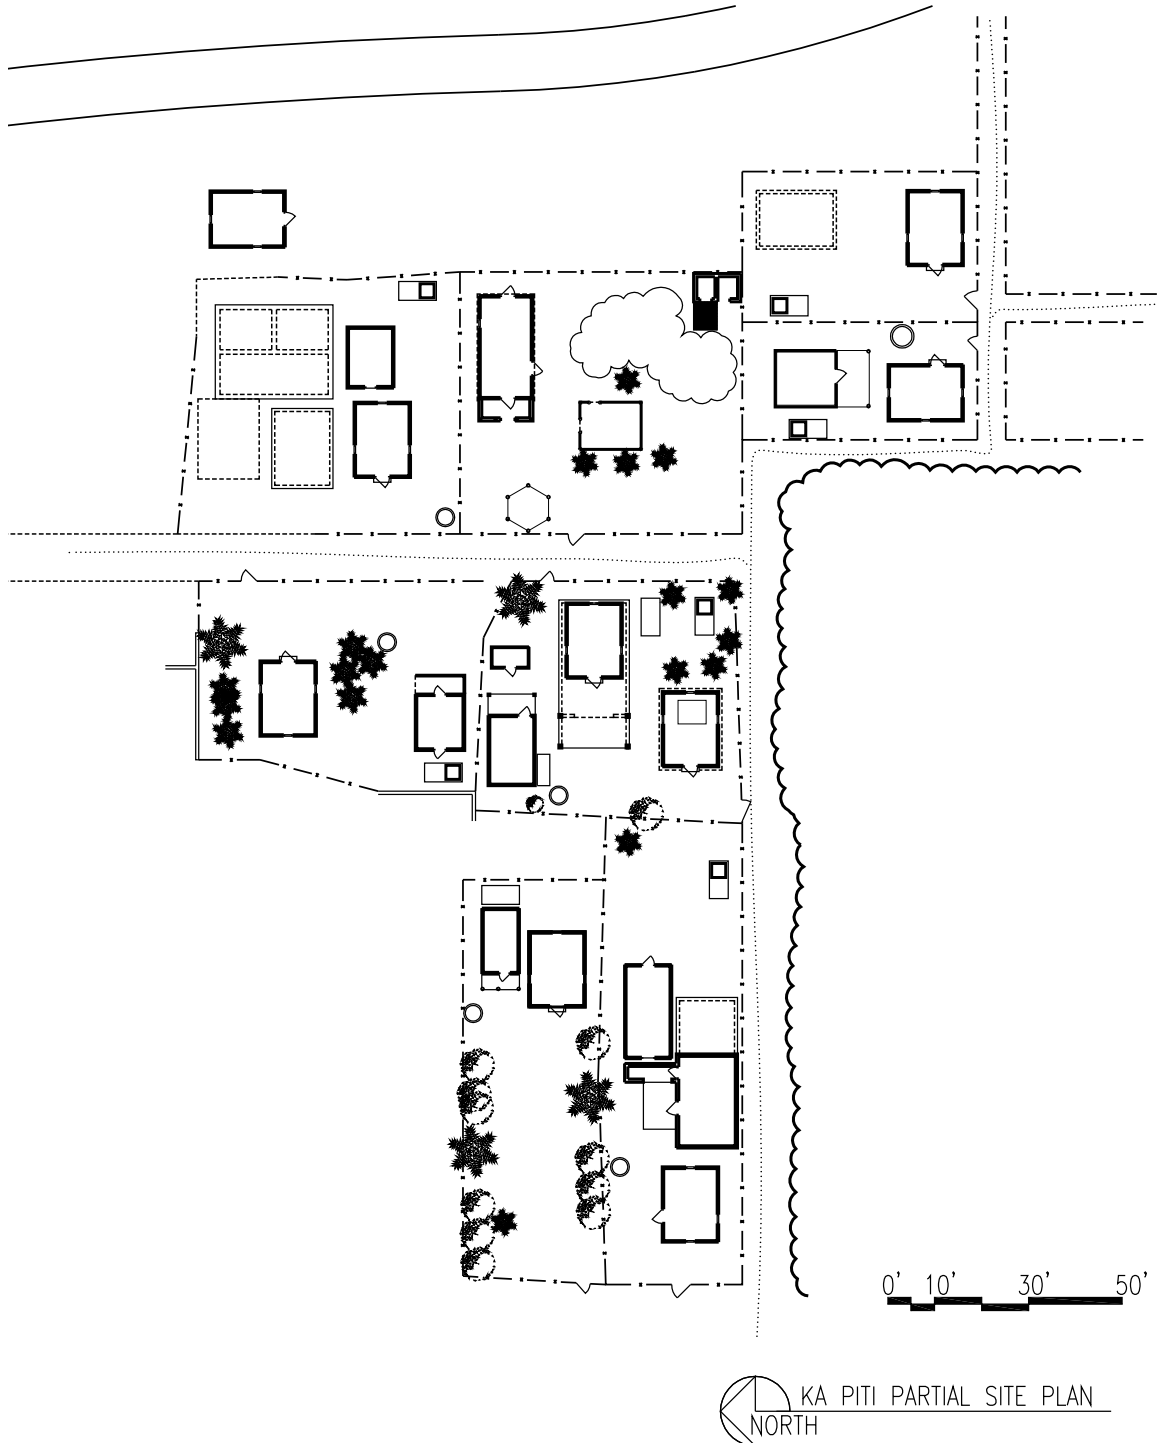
Site plan of the *lakous* under observation in Ka Piti.
